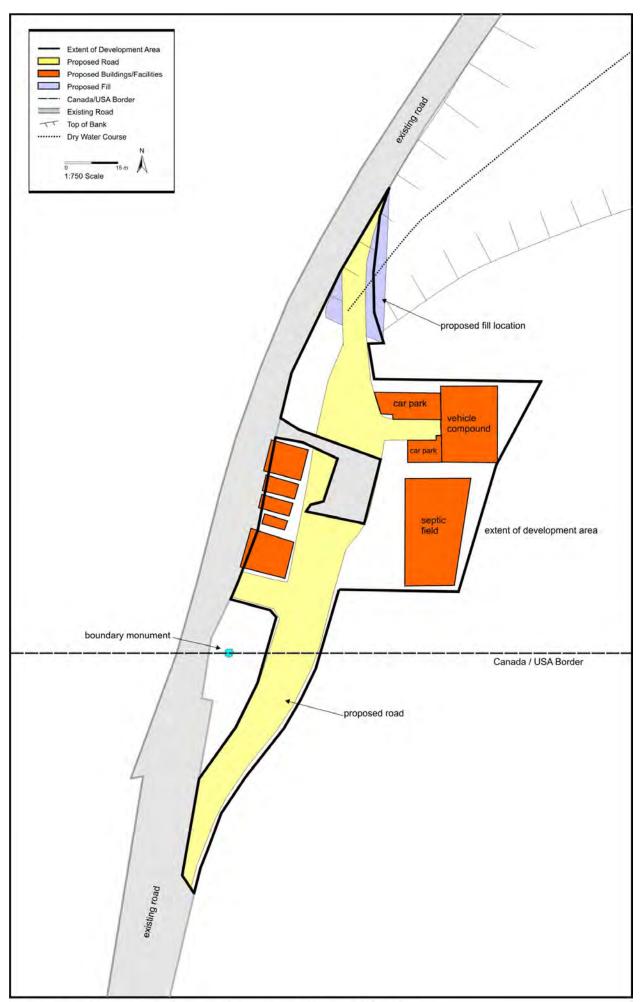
Outline of development showing location of proposed road and facilities (1:750 scale).
